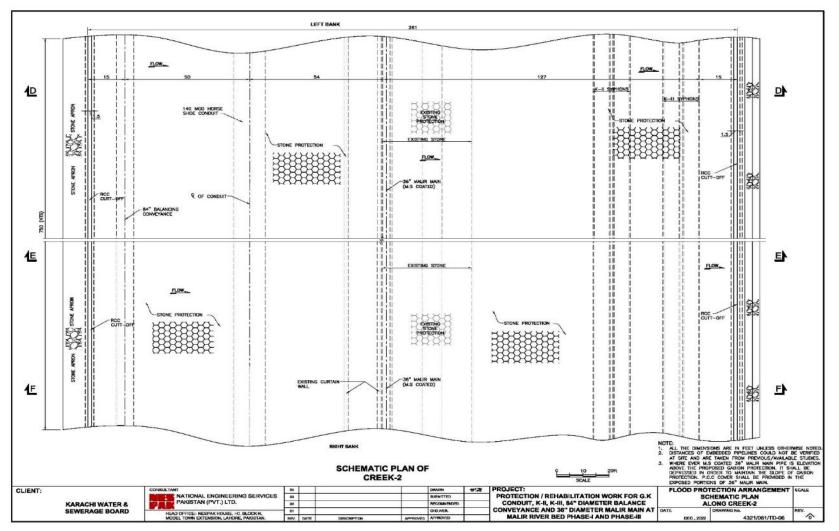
Flood Protection Arrangement Schematic Plan (Creek 2)
